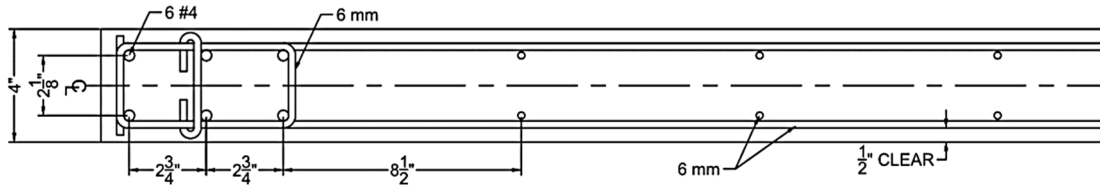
Shear Wall Specimen R2 – Cross Section (Oesterle et al. 1976)
